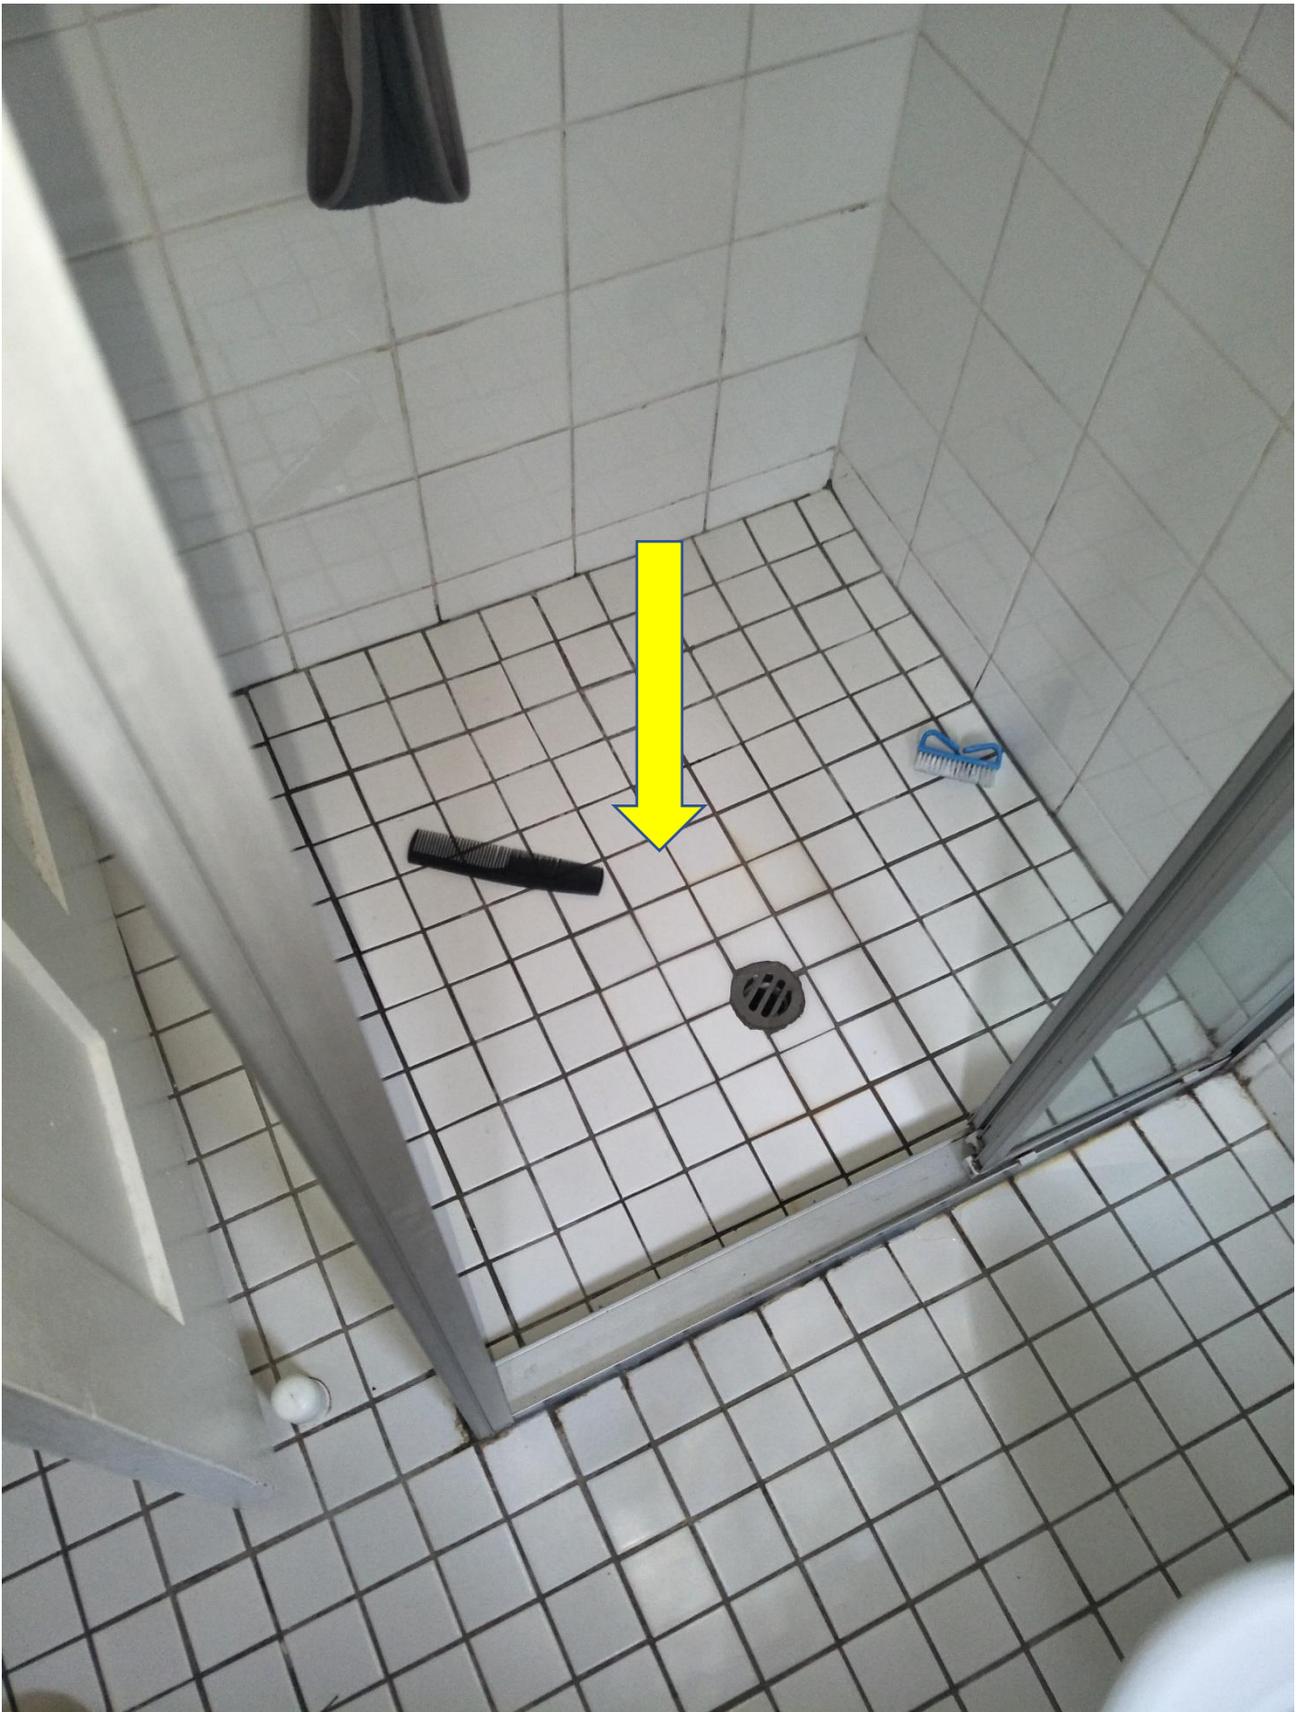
the shower recess requires grouting, Engage a handy man to apply new grout.
